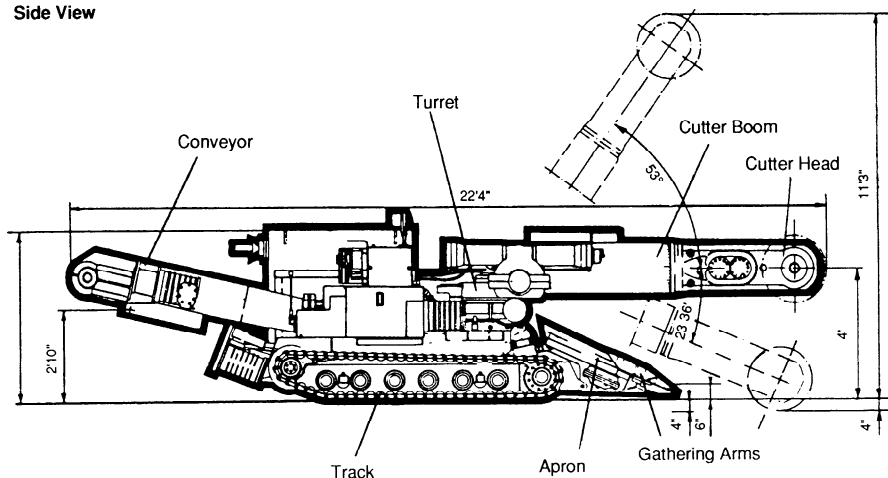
Typical roadheader showing main components. Conversion factor: 1 ft = 0.3048 m.
